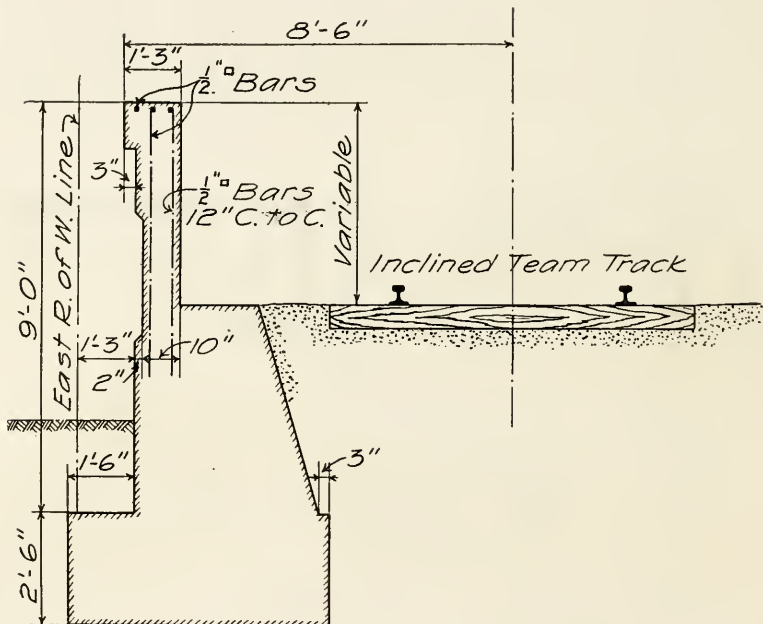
SECTION OF WALL ALONG CHICAGO AVENUE.
